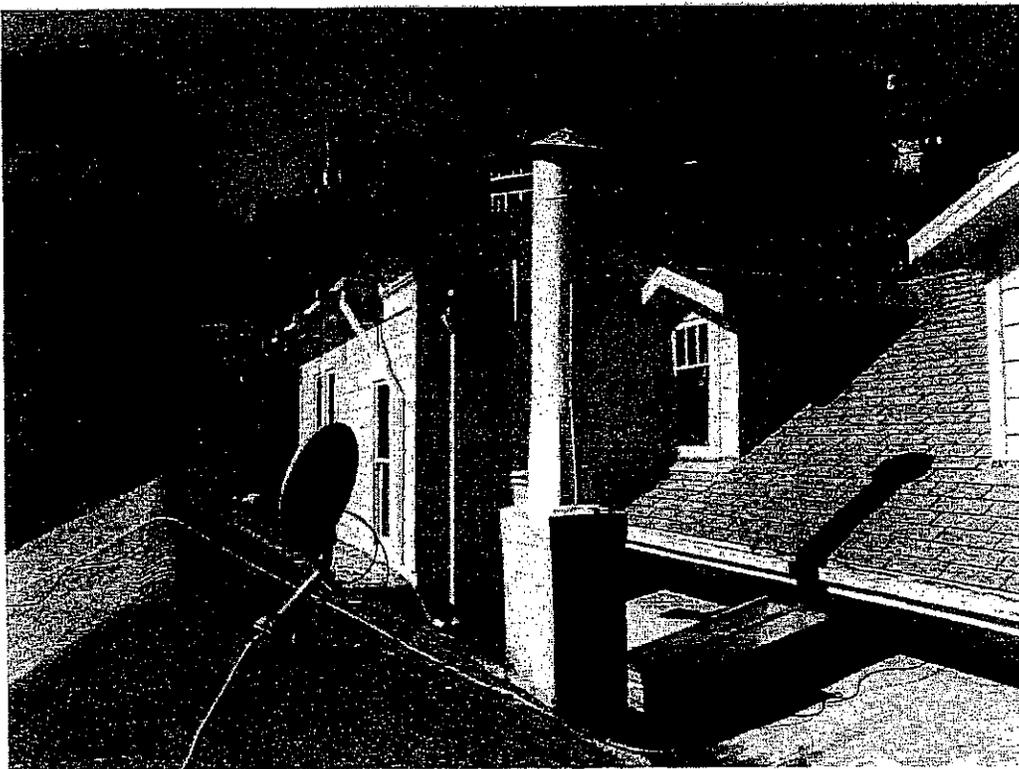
Second Floor Addition from roof (looking south w/original roof at left)
